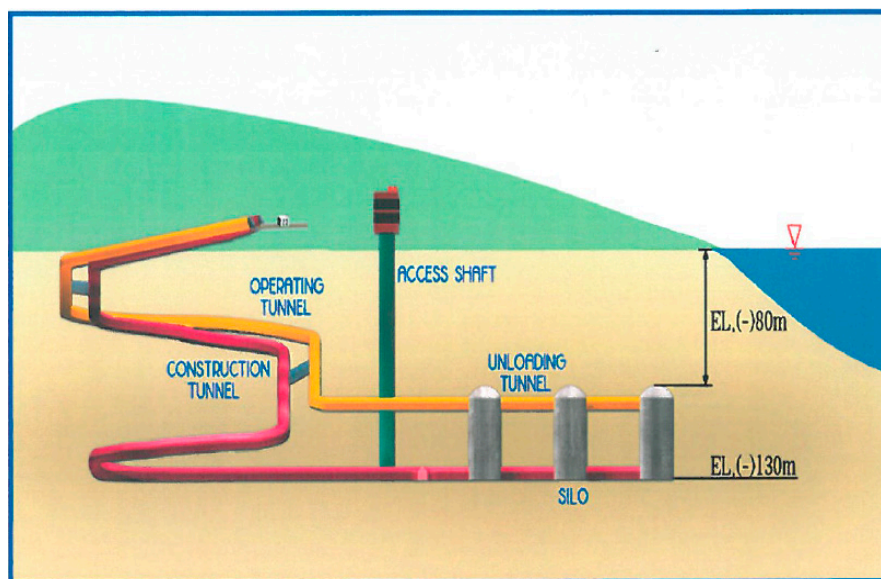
View of underground construction of LILW disposal facilities in Wolsong.
